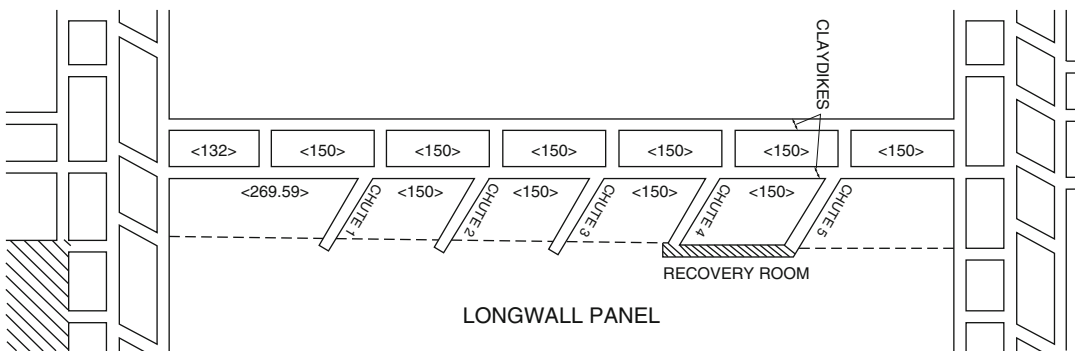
An example of longwall recovery roadway layout utilising chutes (After Tadolini and Barczak 2004)
